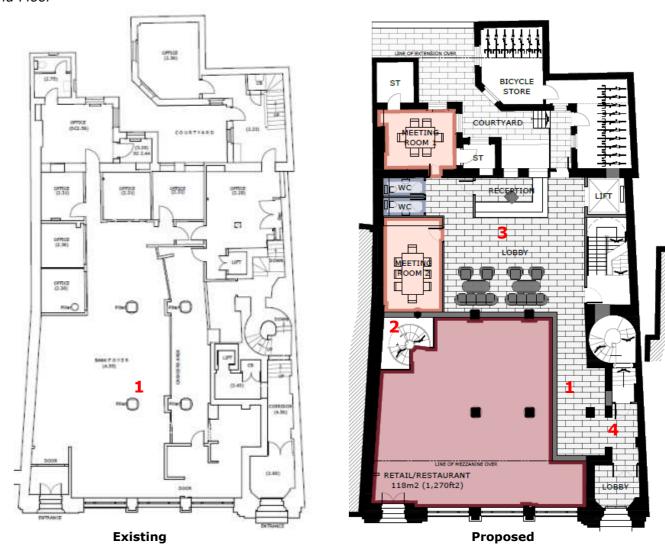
Existing ground floor (left) and proposed ground floor (right).
